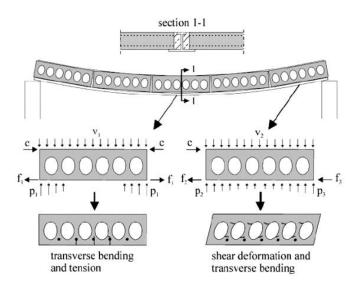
Stresses in hollow core slab on flexible support [10].
